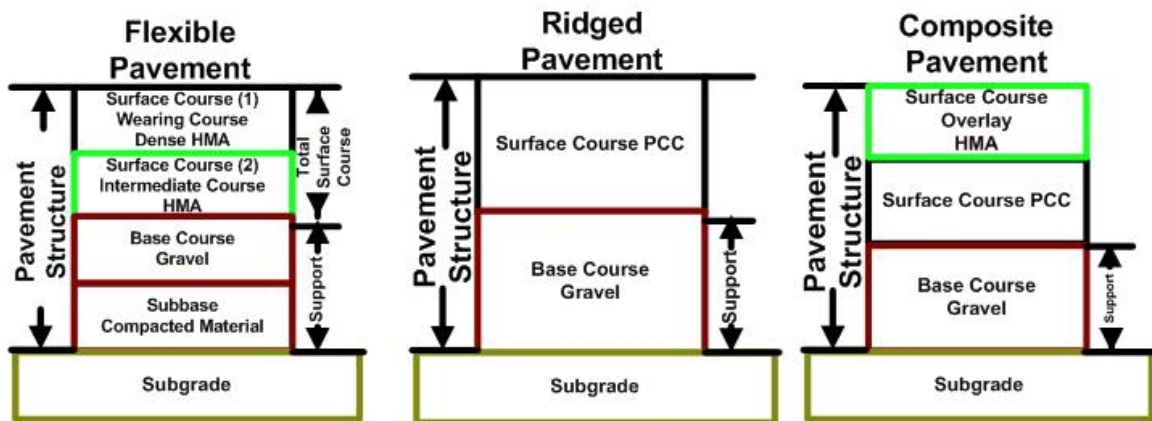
Typical Cross sections of Flexible Pavement (HMA or WMA), Rigid Pavement (PCCP) and Composite pavement
